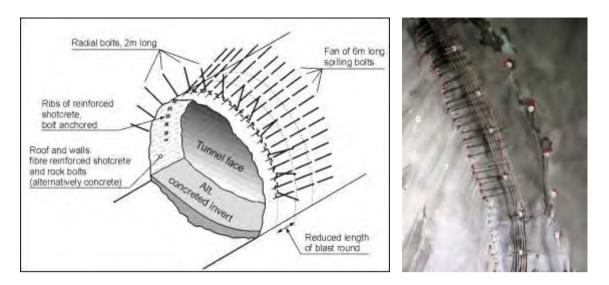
Principle for excavation through poor stability weakness zones based on short round lengths, spiling and reinforced ribs of sprayed concrete (left, based on NFF, 2008), and photo illustrating spiling and shotcrete ribs in tunnel with heavy support also of the face (right).
